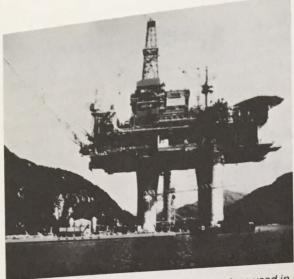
CONDEEP, a gravity type structure used in the North Sea is built of concrete and is secured to the sea floor by its weight. Bottom cylinders are used for storage of oil and drilling takes place through the four vertical columns. (Courtesy of Foster Wheeler Petroleum Development (Canada) Ltd.)
